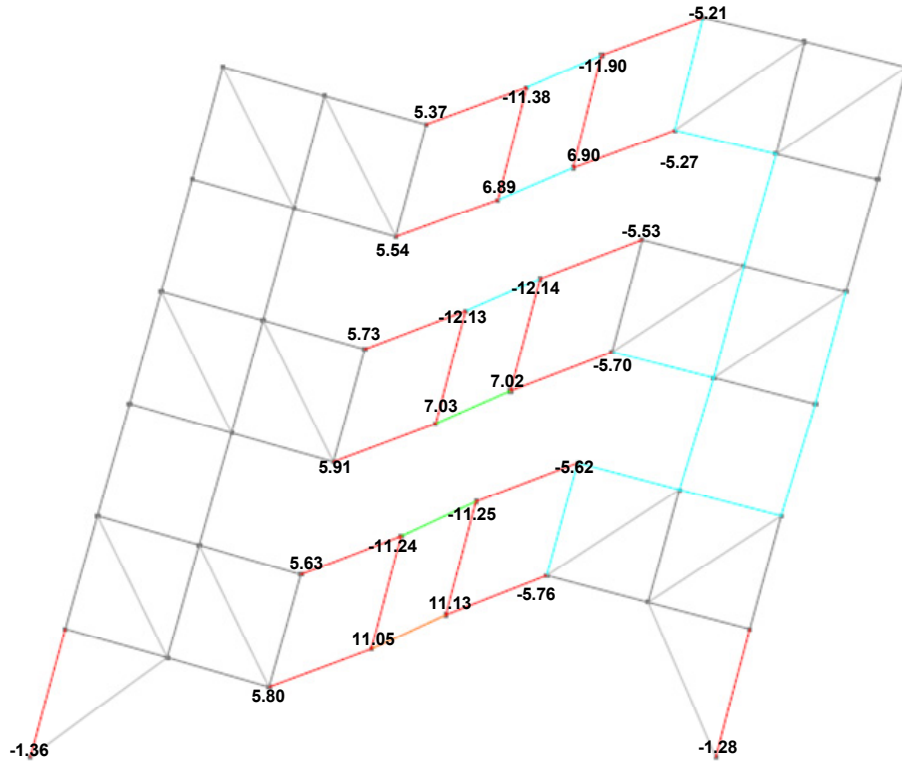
Bay 1 deflected shape with plastic hinge rotations (%) of the 6-Story building at 3% roof drift.
